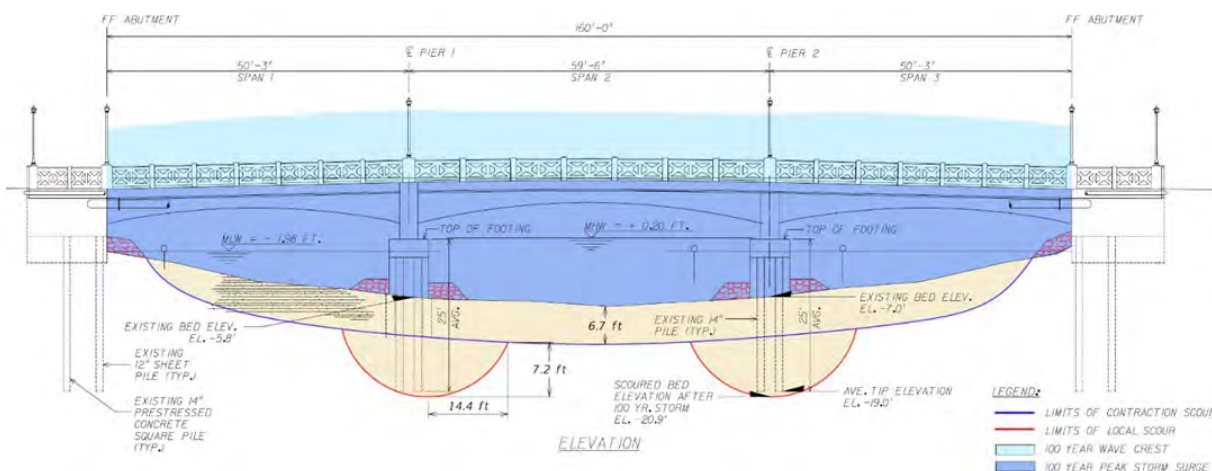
BRIDGE STORM SURGE, WAVE CREST AND SCOUR ELEVATIONS
